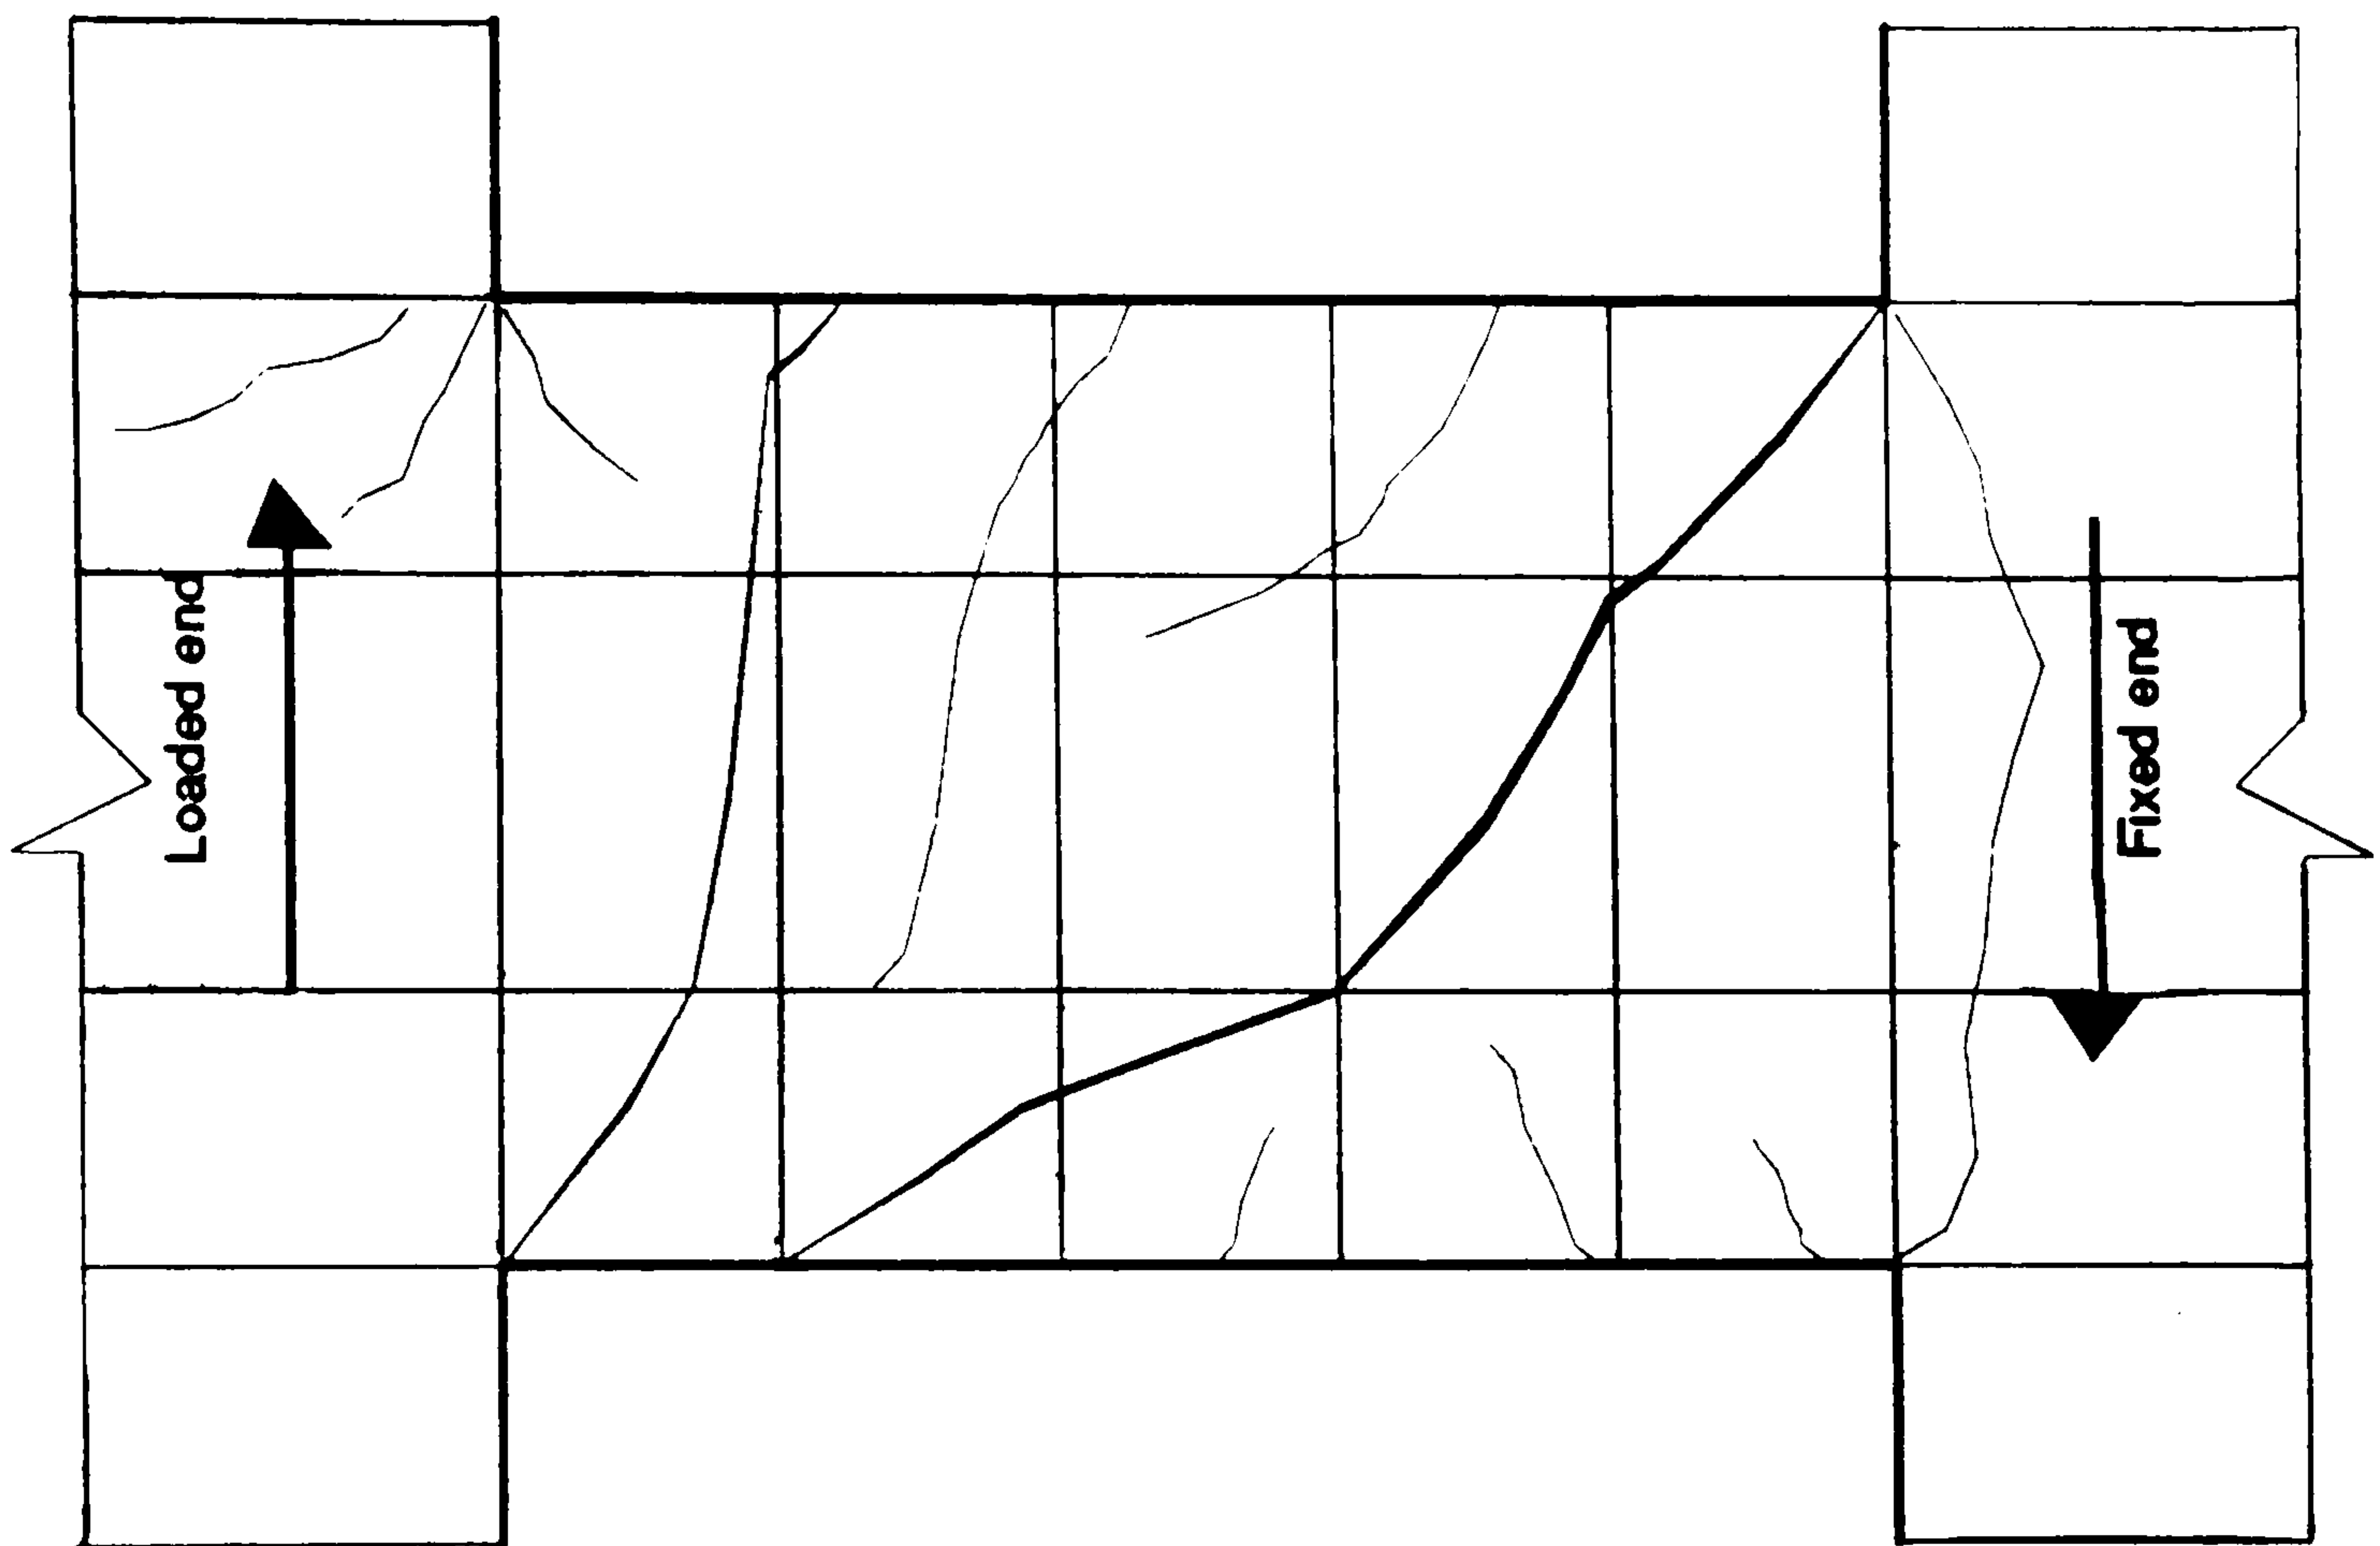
Failure mechanism and crack pattern for beam CBS2
